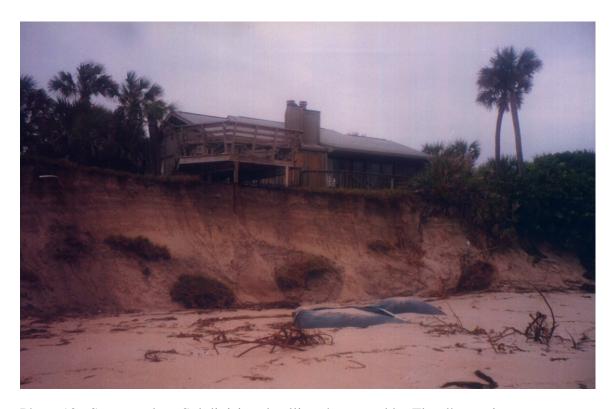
Summerplace Subdivision dwelling threatened by Floyd's erosion.
